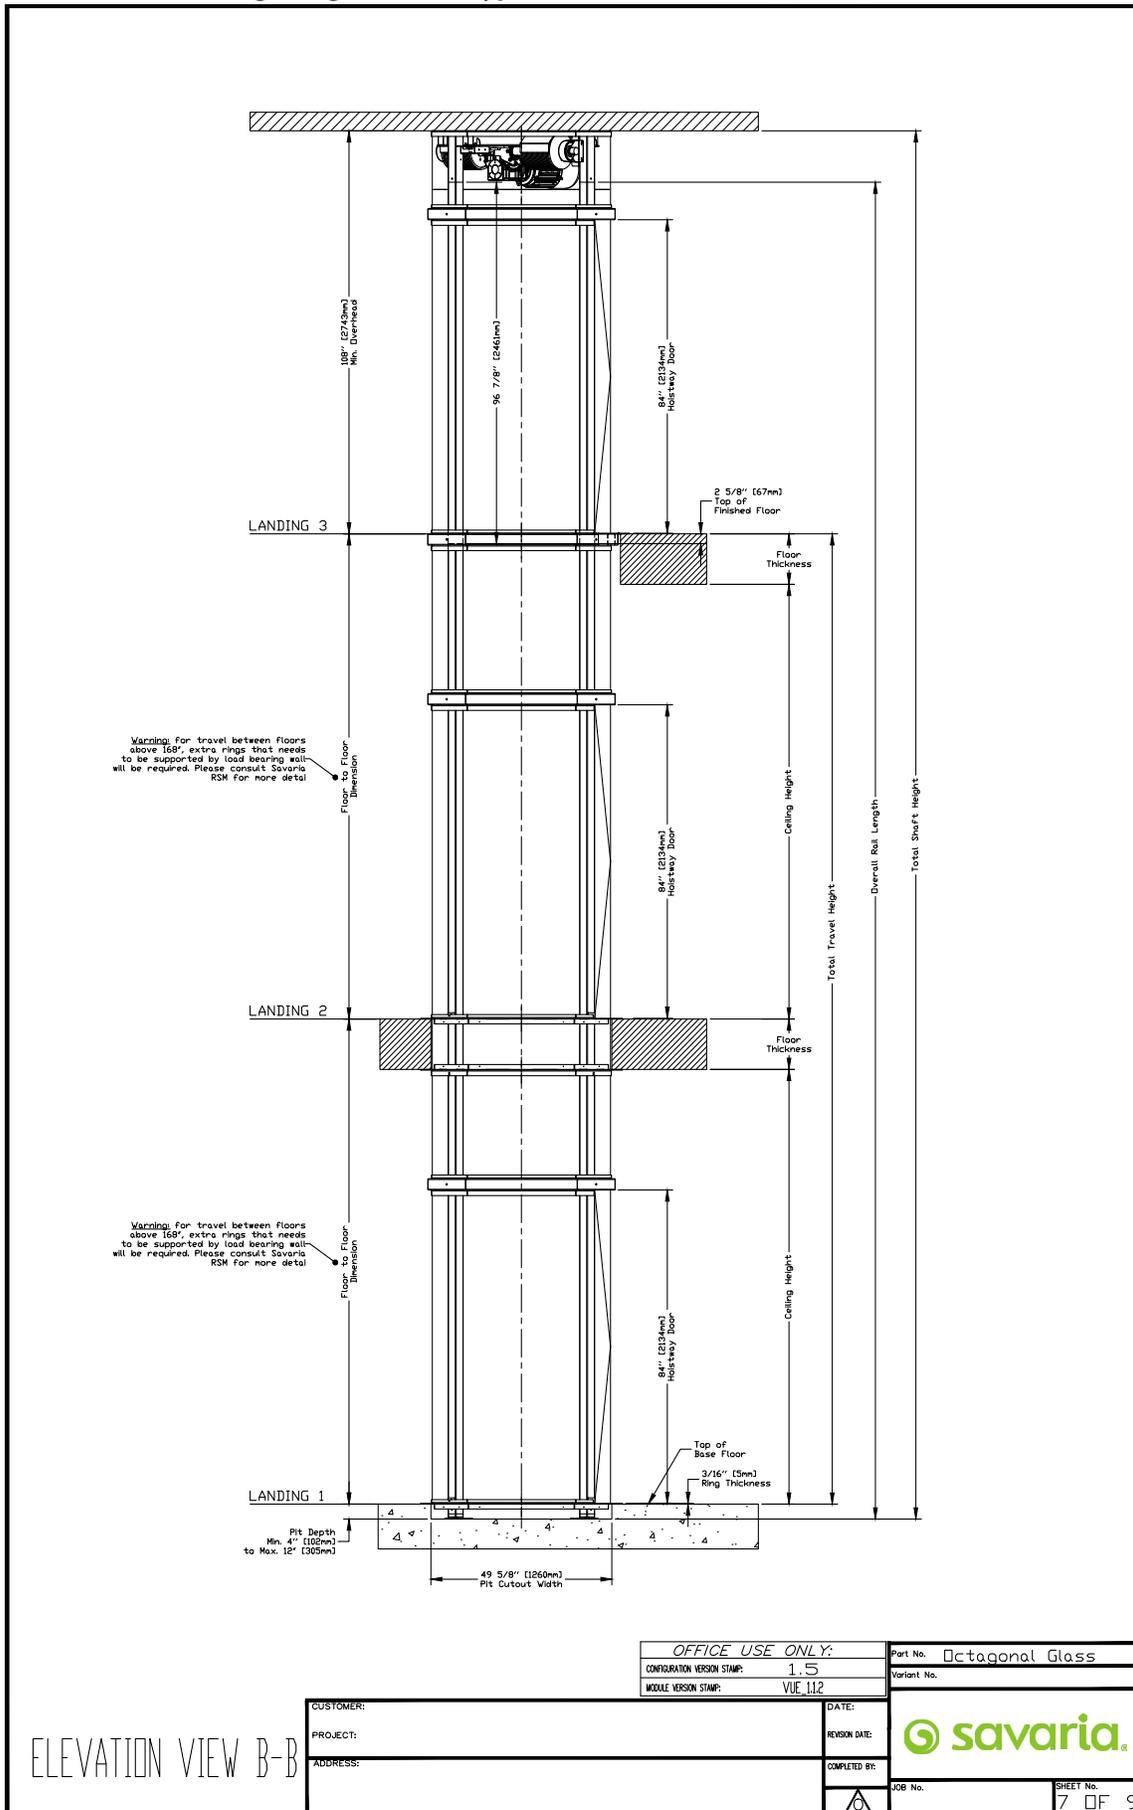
Pit cutout/thru-floor cutout - octagonal glass (OGM) type 1, 2 or 3
